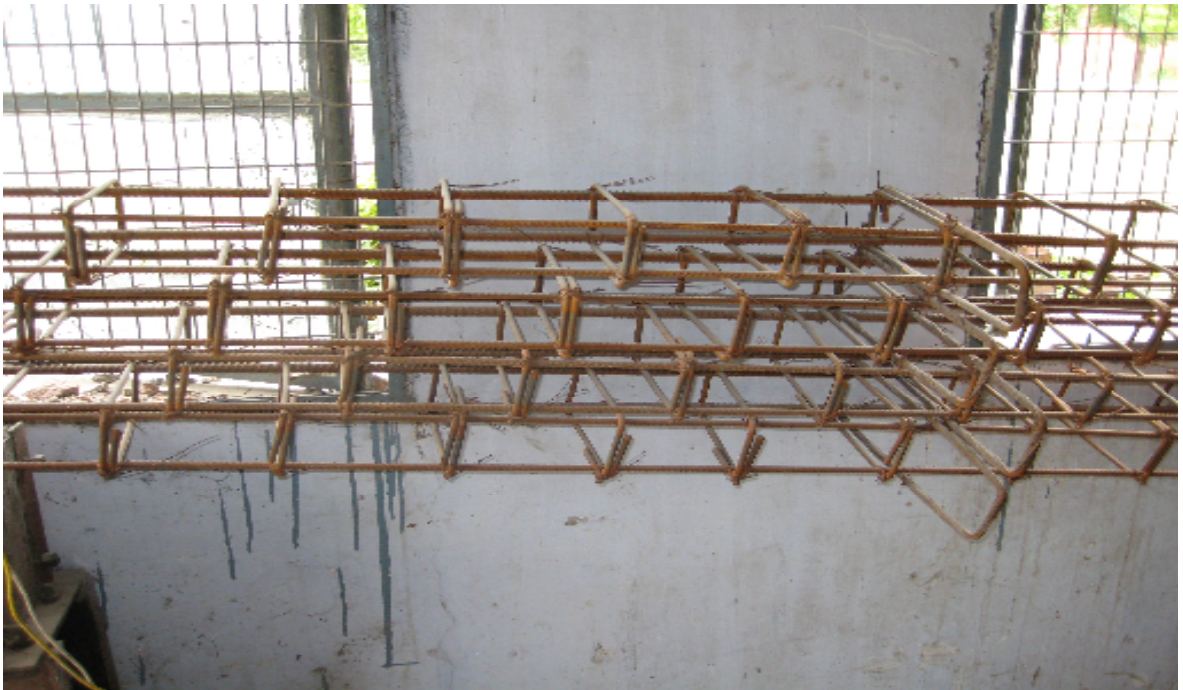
TENSILE REINFORCEMENT STEEL, WITH HANGER BARS & STIRRUPS
